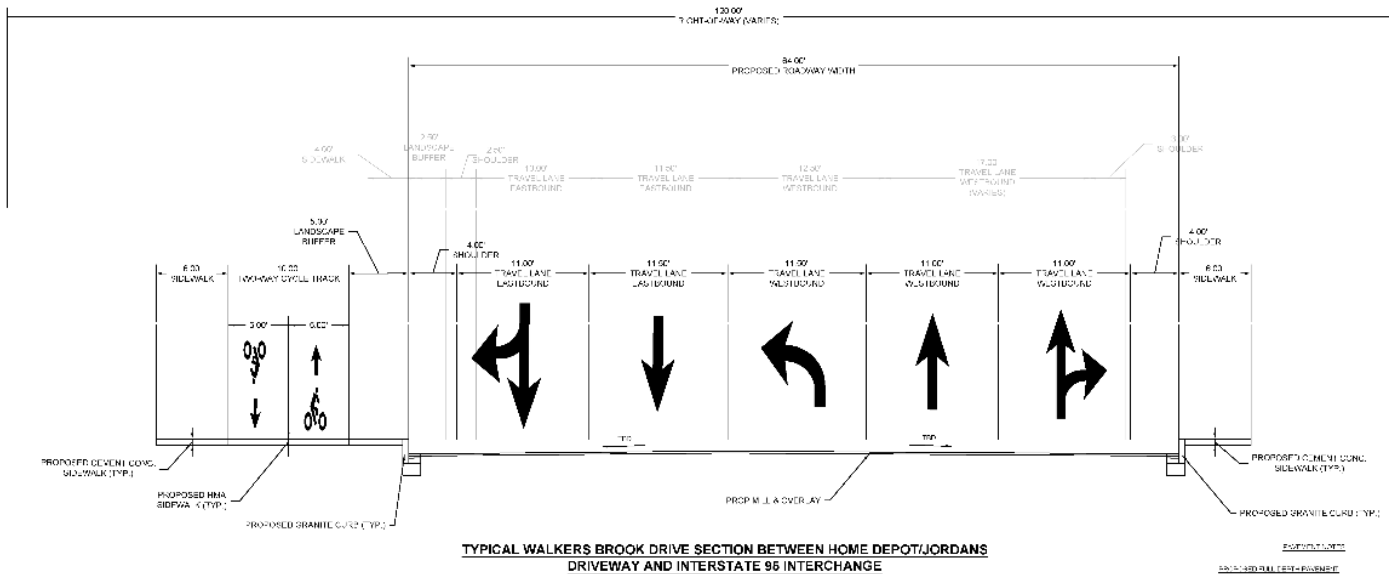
Alternative 3 (off-road two-way cycle track) – Typical Section 2
